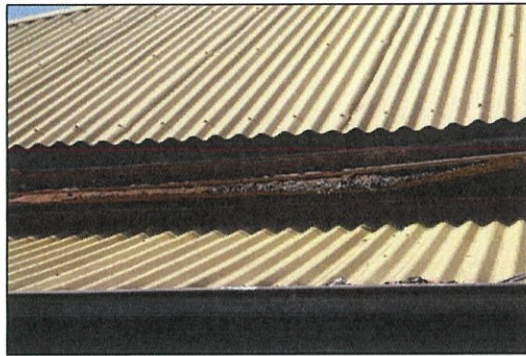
Collapse and corroded gutter to main roof, northern elevation.
